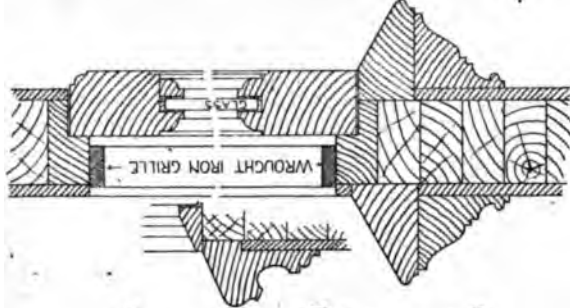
DETAILS OF JOINT BETWEEN UPPER AND LOWER PARTS OF A DUTCH DOOR. DRIP MOLDING MAY BE OMITTED IF DOOR IS SHELTERED BY A PORCH ROOF.
